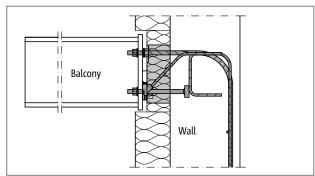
Schöck Isokorb® T type SK-M1: Special construction for wall connection on the basis of the shear force bearing levels M1 for wall thicknesses from 200 mm
